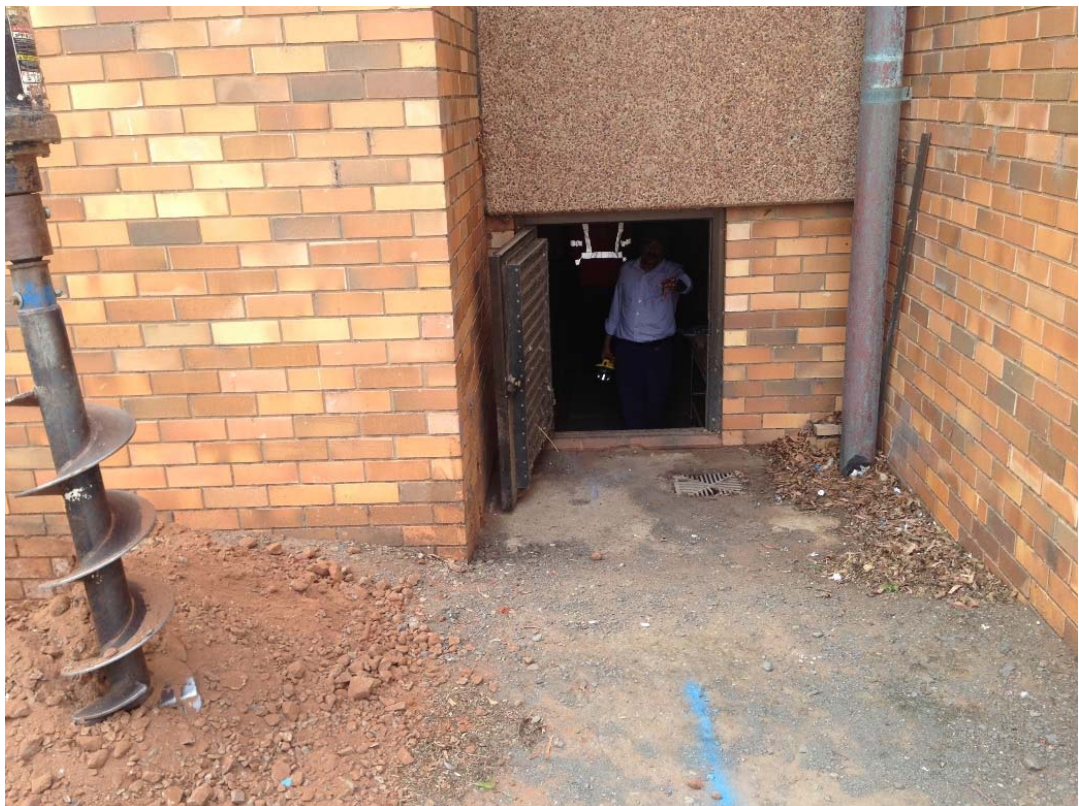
View of entrance to subfloor/basement of General and Medical Ward Building
